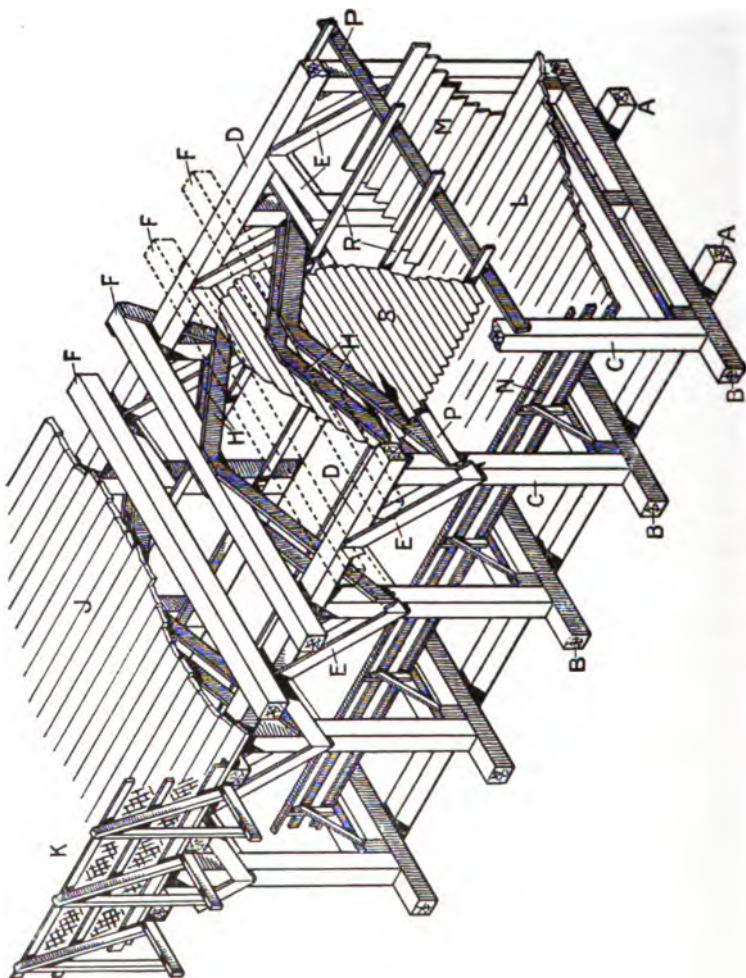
A WELL-DESIGNED SIDEWALK SHED.
